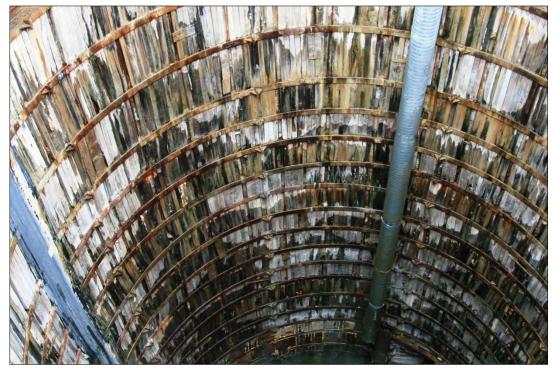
View looking inside the access shaft (already constructed as part of development of the first tunnel).
